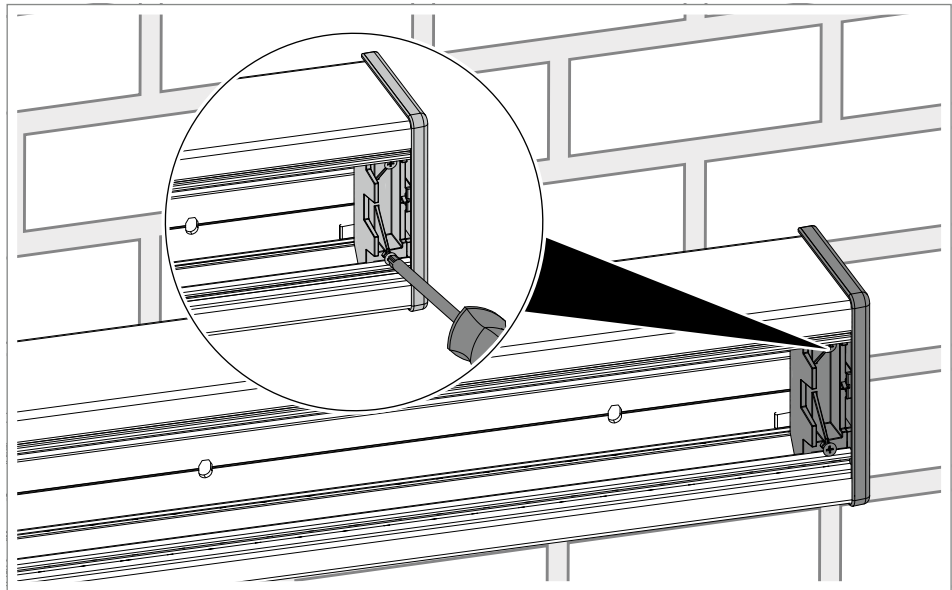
Mounting the end piece (device installation trunking Rapid 80® GK)
